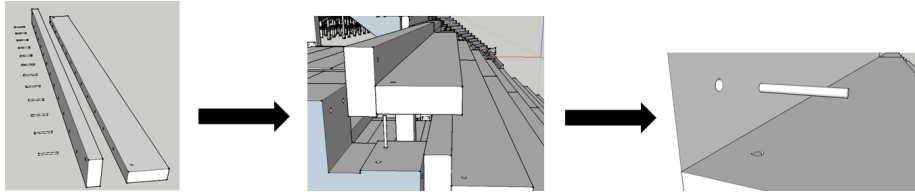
Assembling the stand element, placing it and fastening it, deconstruction happens in the reverse order.
